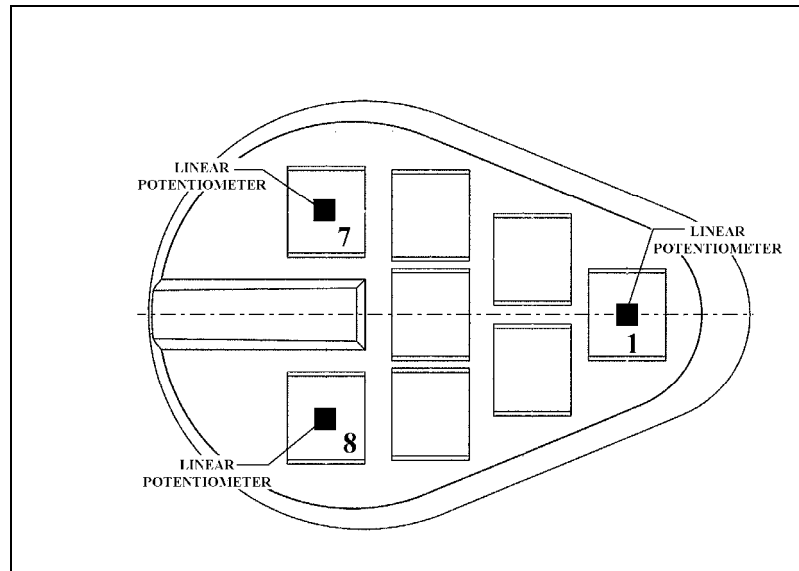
Linear Potentiometer Locations (Plan View) (Modified IRIB Specifications and Construction Plans)
